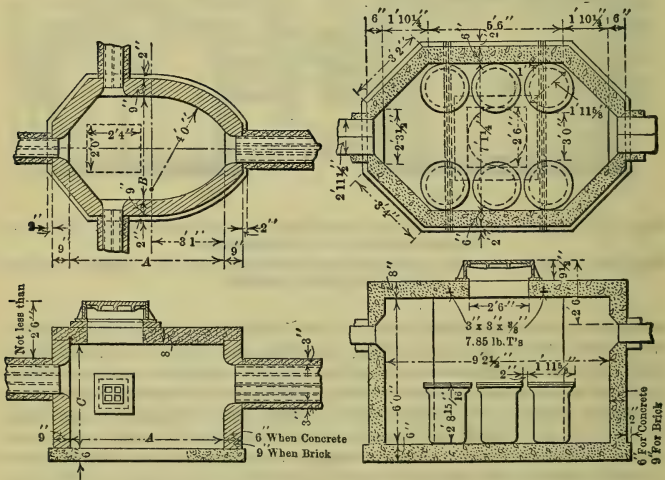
Vault size 8 to be used on runs of 13 to 24 ducts of conduit when intersected.
